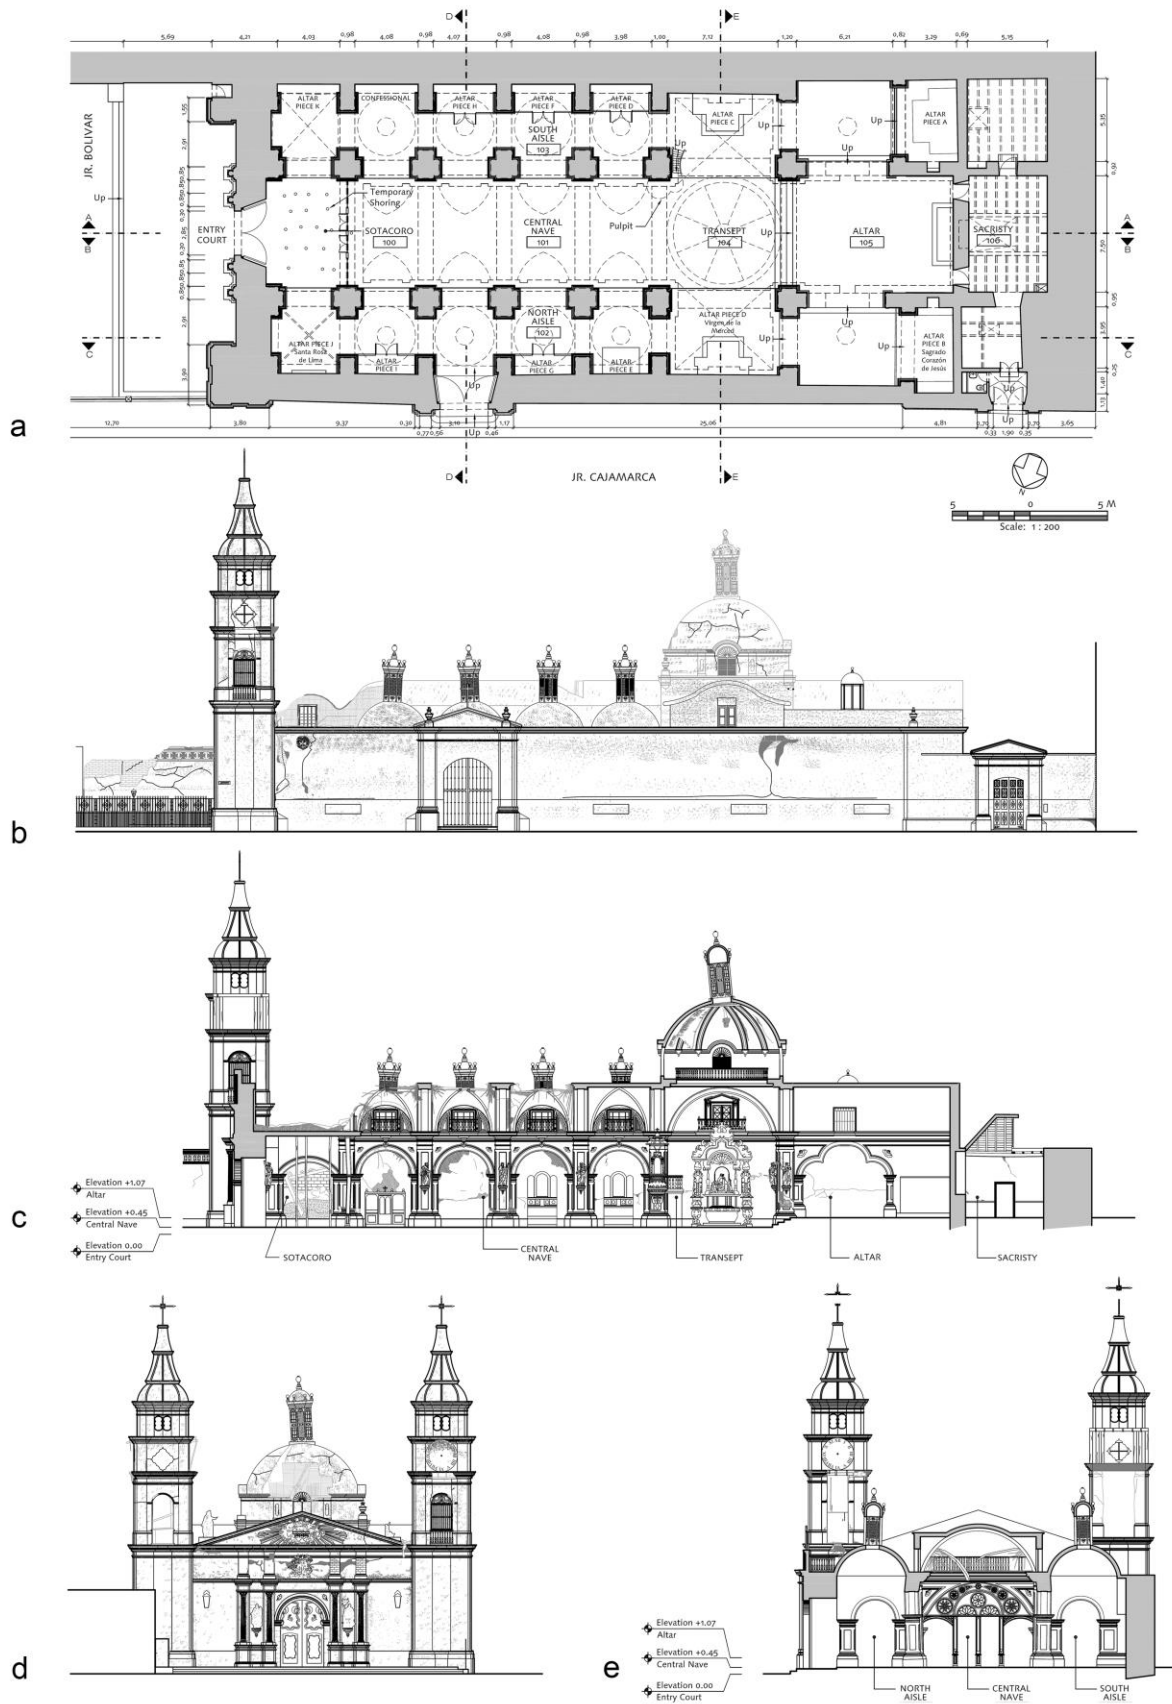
Architectural drawing of Ica Cathedral: a ground floor, b longitudinal elevation, c longitudinal section, d front elevation, e transversal section (m) [7]
